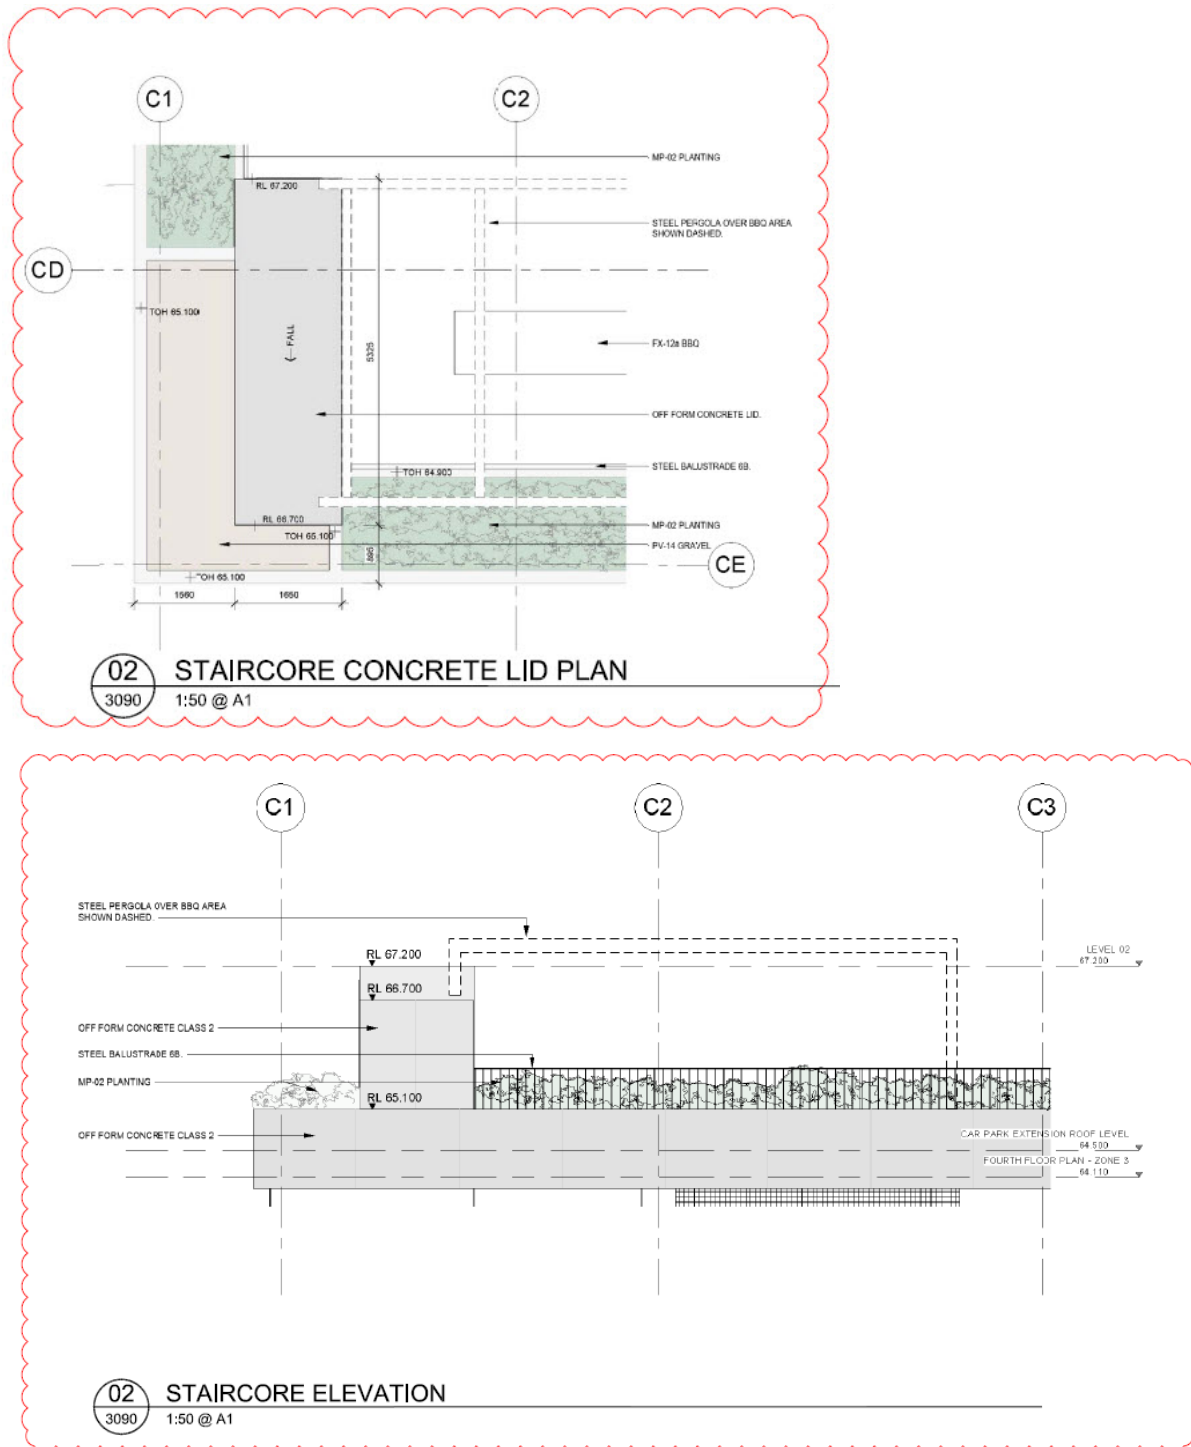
PROPOSED Stair details – plan and elevation (Source: COX, Revised A-DA-2190, Revision 05 and A-DA-3090, Revision 04)
